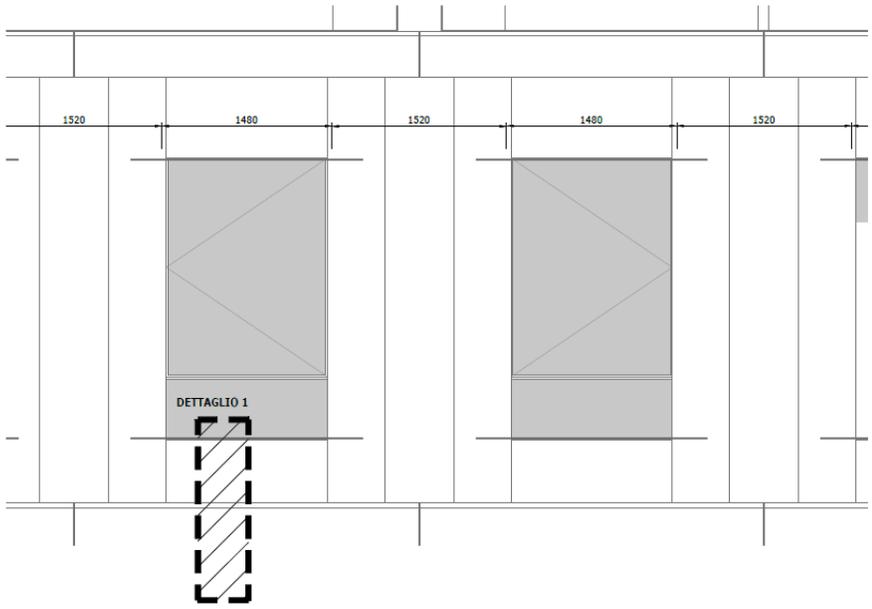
East Elevation WT-1C façade module Key. Source: Author
